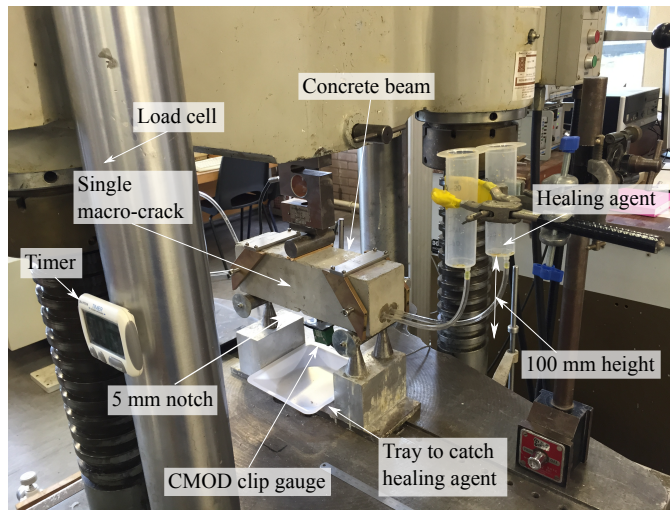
Test setup for three-point bending characterisation of pattern on fracture surface test
